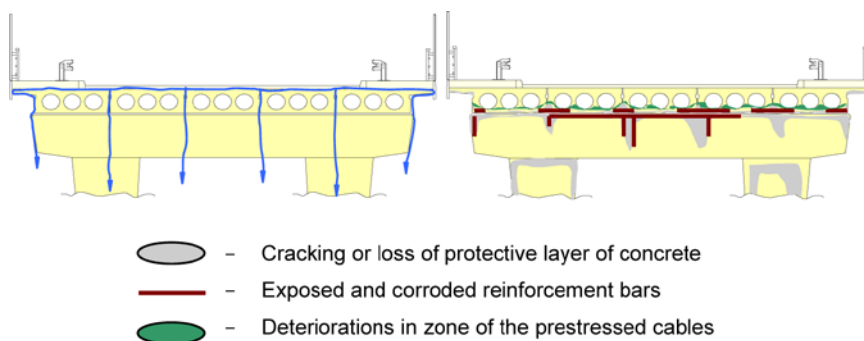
Cross-section of overpass with marked ways of water penetration on girders, head beams and all elements of the substructure(left) and areas with characteristic deteriorations(right) [3]
